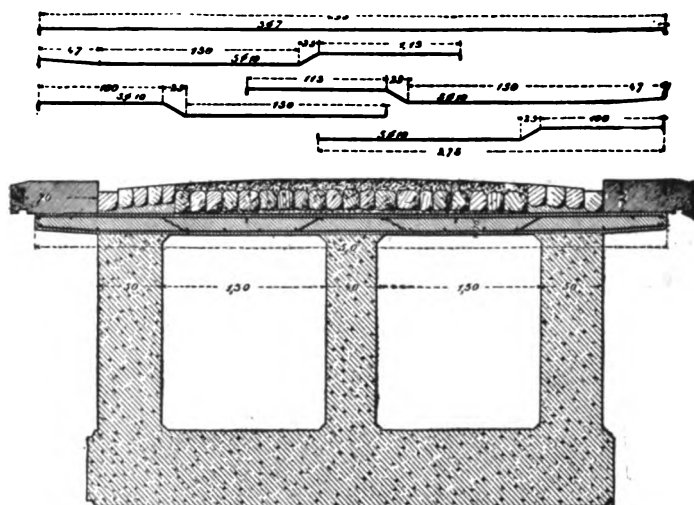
Highway bridge near Hamburg. Section through superstructure and thoroughfare.
